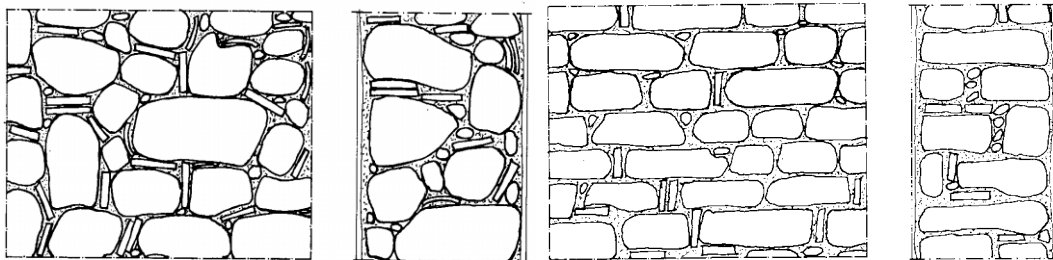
Masonry with irregular fabric (Randazzo, 1988).
